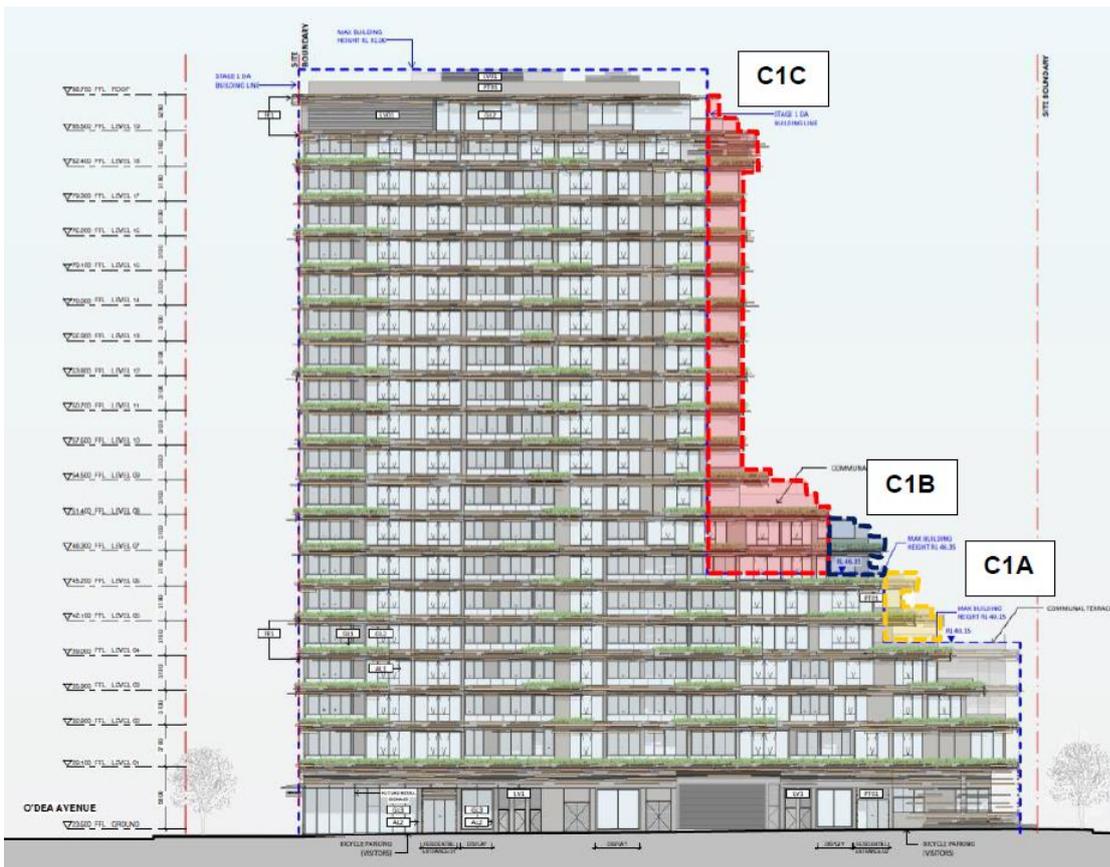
The plan highlights the areas of the detailed design (development application D/2018/802) that exceed the maximum height of buildings standards
